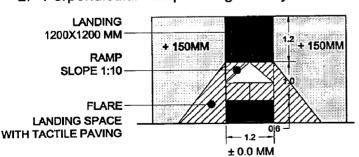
Sidewalk Driveway Detail Source: By Author
